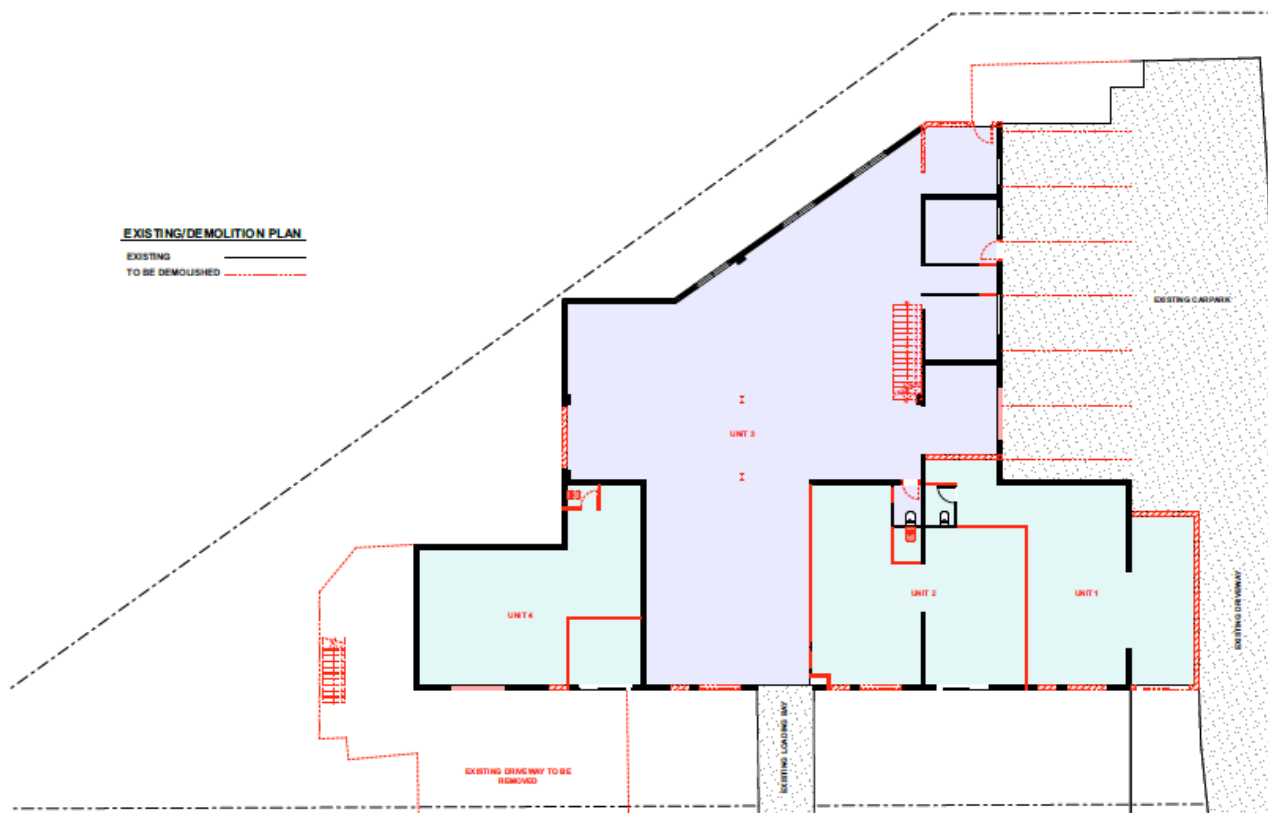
Extract of Existing/Demolition Plan (Source: Story Design Collective, , 24/2/2023)
